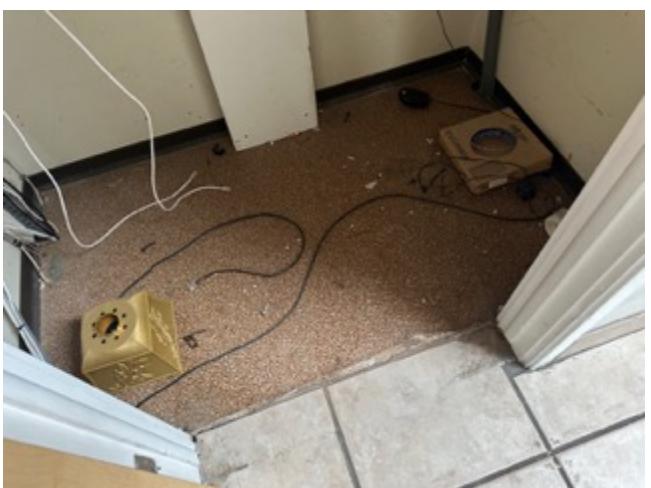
Asbestos Containing Rolled Vinyl Flooring contains 17% Chrysotile Asbestos
